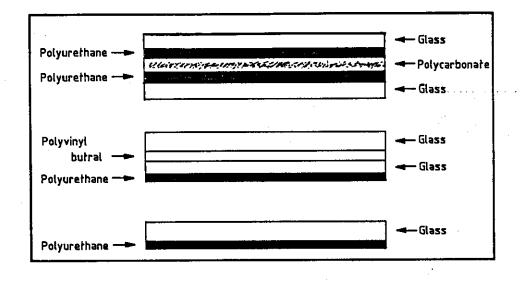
B3.1: TYPICAL NEW SECURITY GLASS CONSTRUCTION
